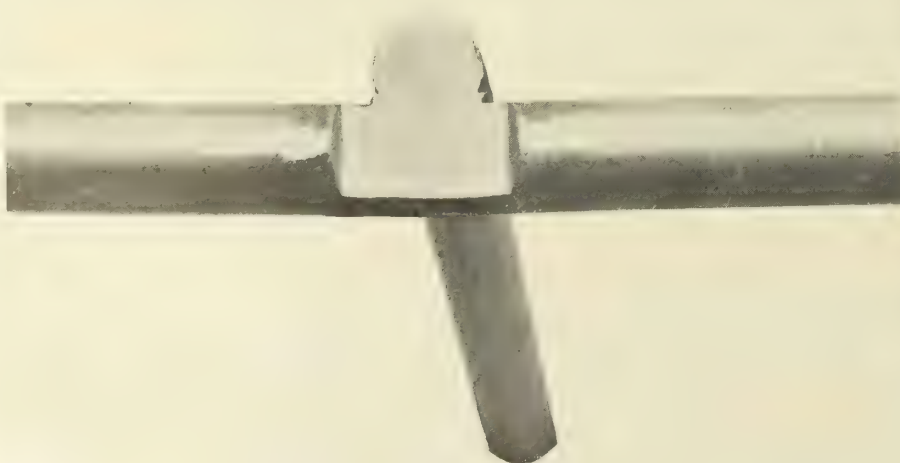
A PIECE OF ELECTRICALLY WELDED FABRIC
